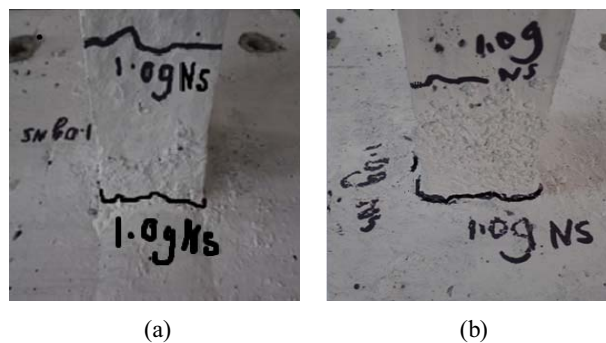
Damage of column specimen after seismic shaking table test. (a) Normal Concrete (NC)(b) Treated Crumb Rubber Concrete (TCRSFC).
